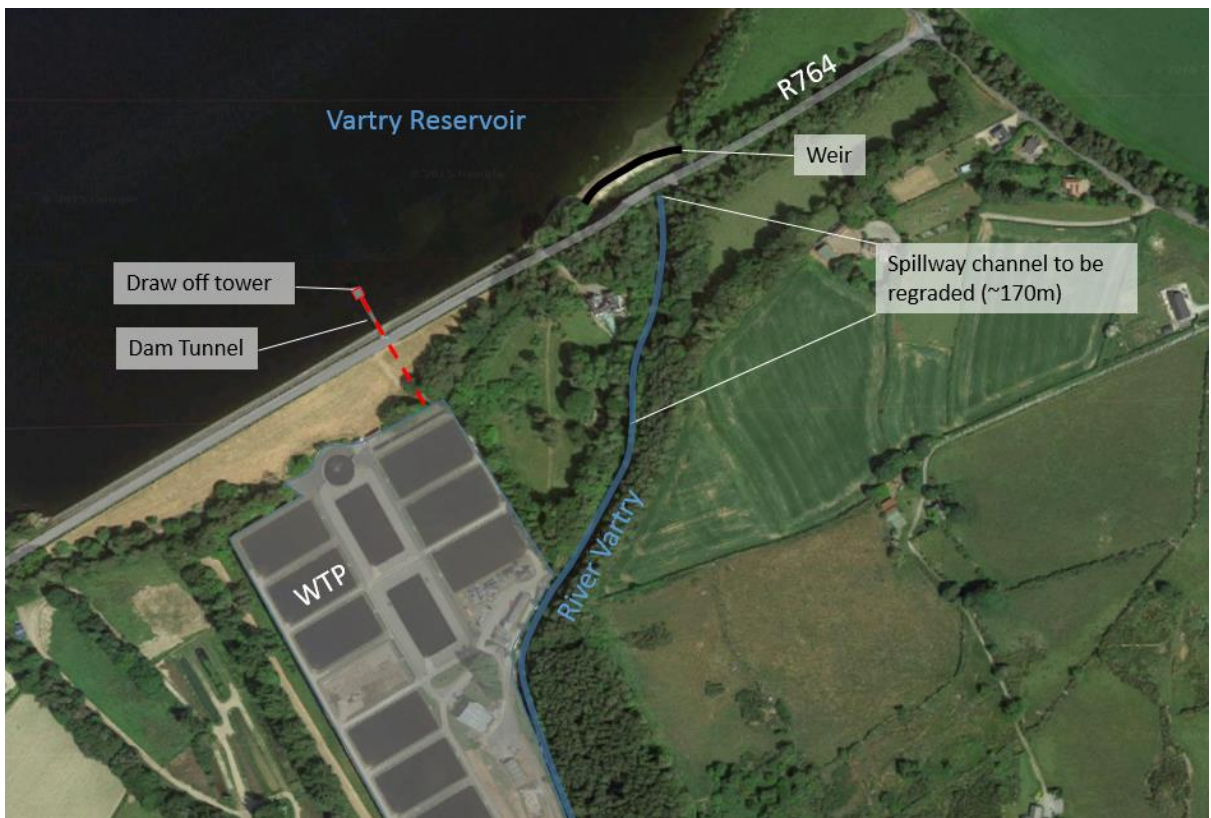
Aerial Photograph of the Proposed Reservoir and Spillway Works
